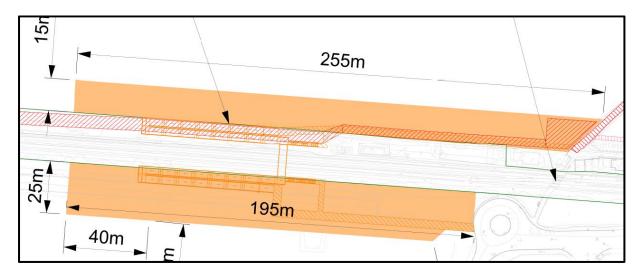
Depiction of possible additional land required to provide a ramped bridleway bridge at Peckfield Level Crossing
